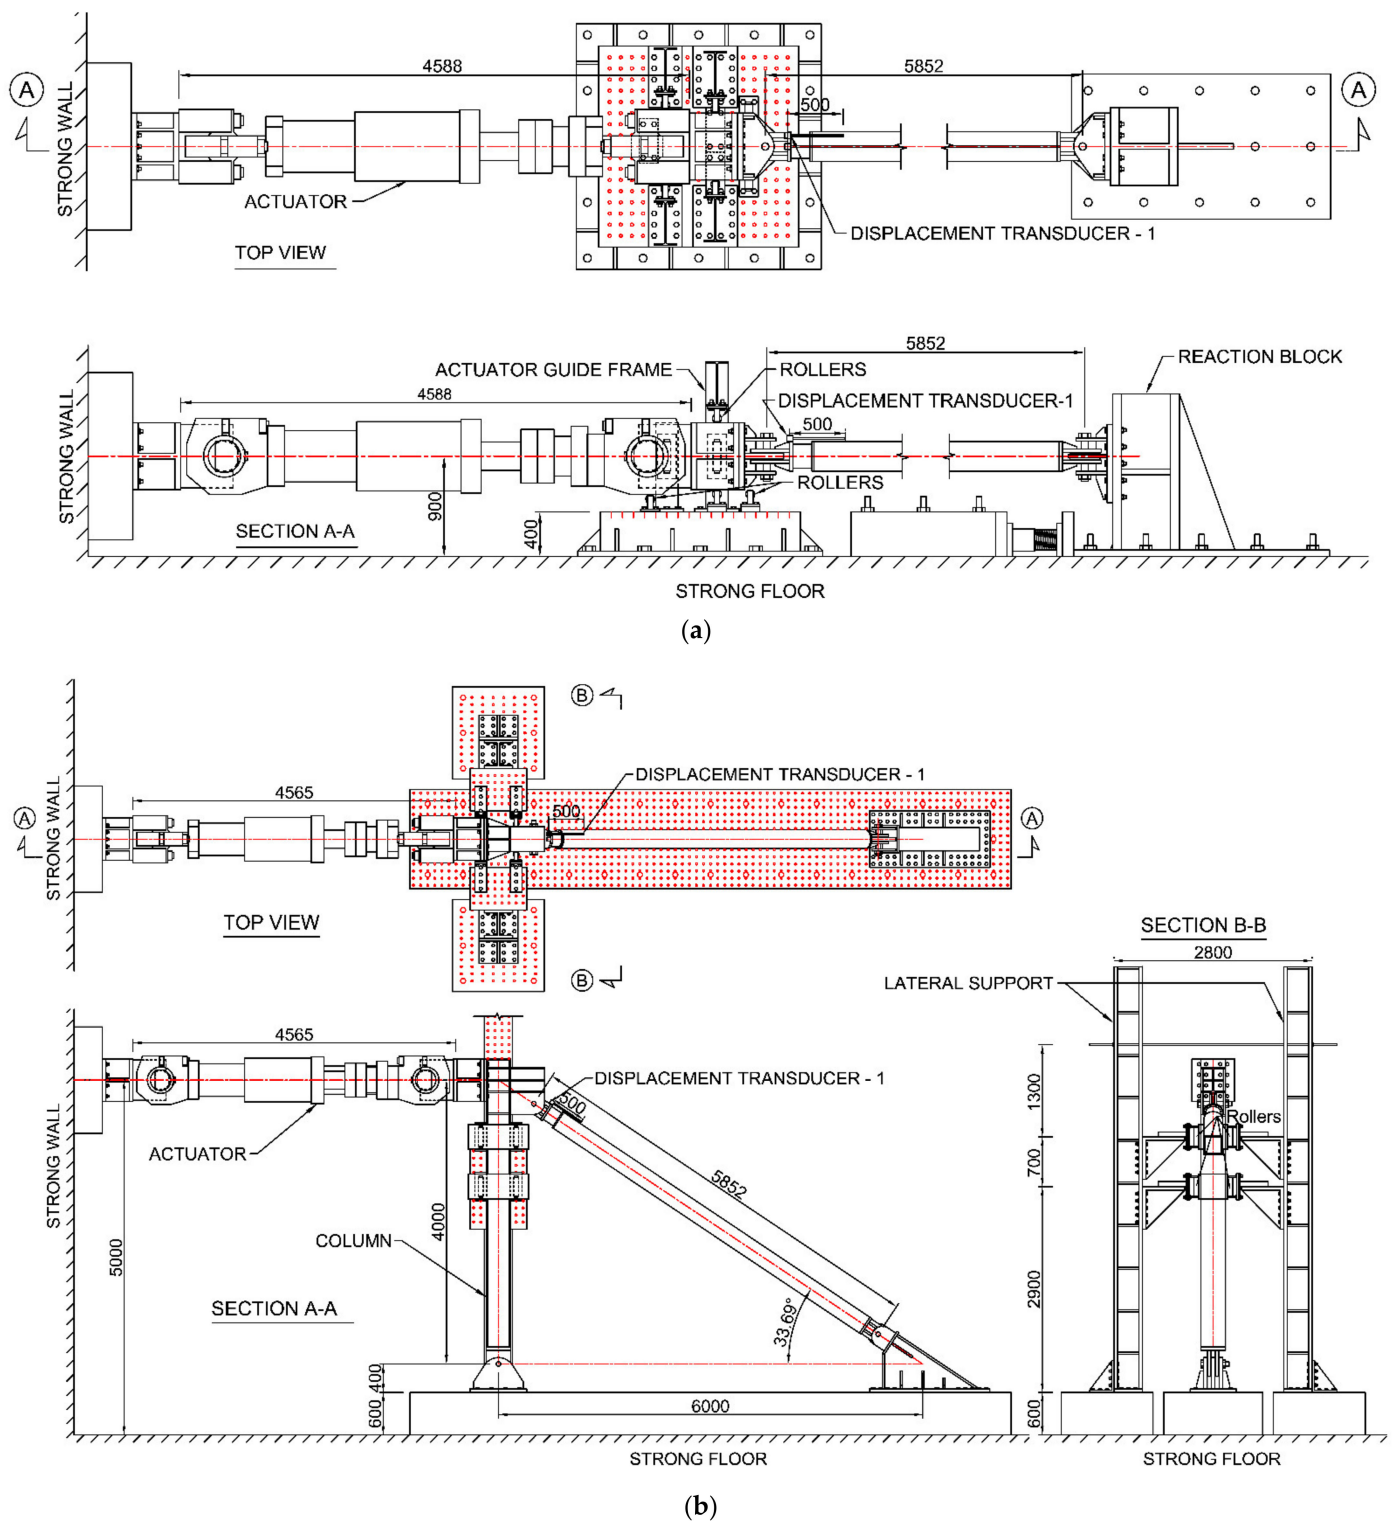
Test setup. (a) Brace test; (b) subassembly test. (All dimensions are in mm).
